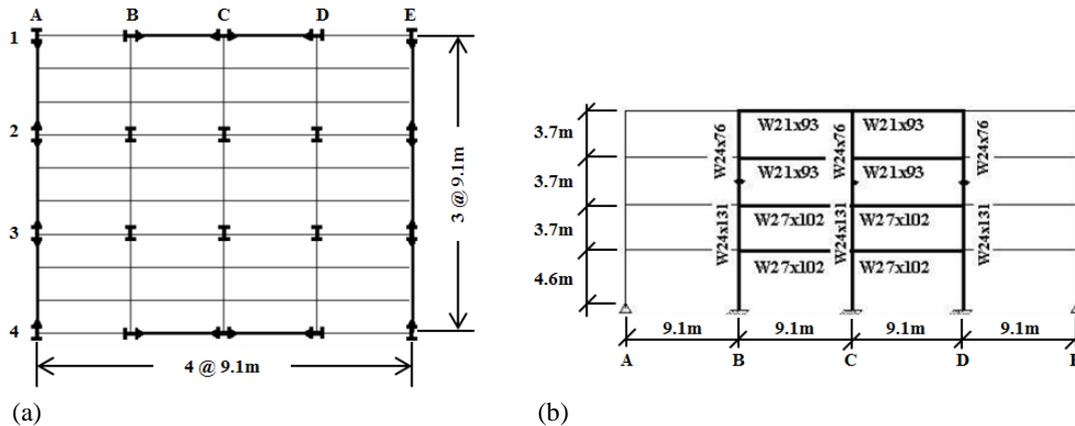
4-story steel structure: (a) plan view and (b) elevation view on line 4
